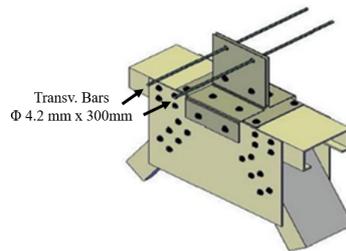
The TWP Thin-Walled Perfobond connected to the lipped channel CFS of the upper chord of the truss (Leal [6]).
